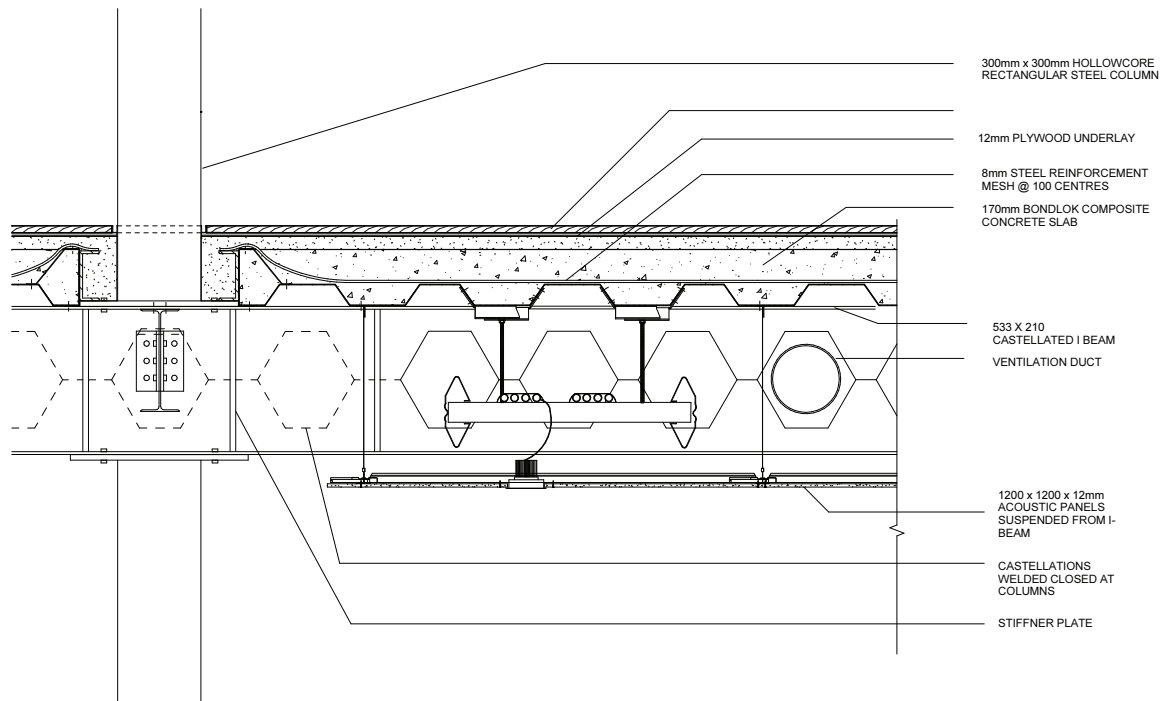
Detail of Cloumn to Beam Connection and Ceiling Void. NTS.
